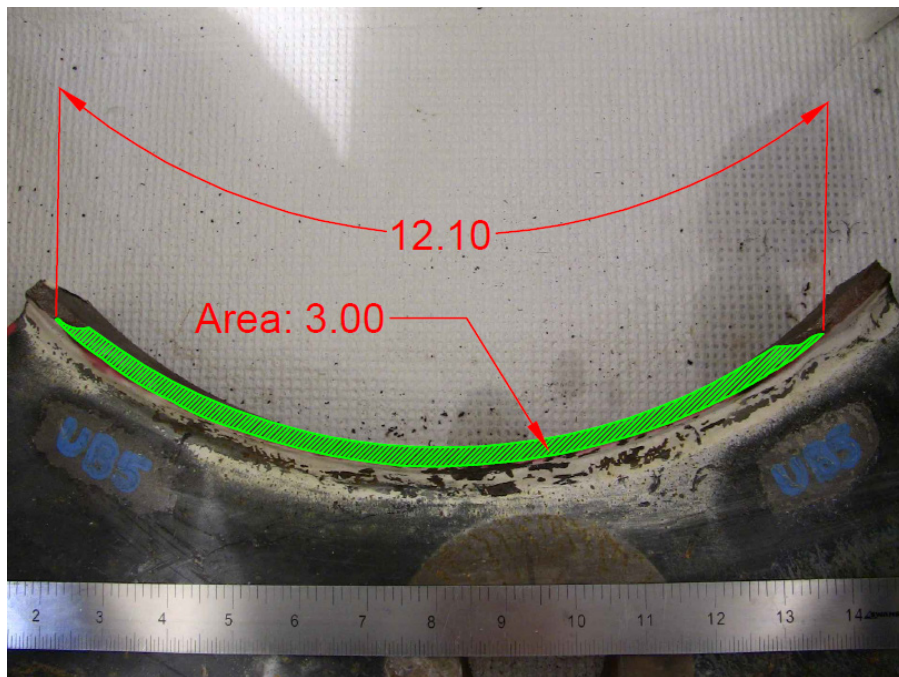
Photo. Specimen 1U3 fracture surface.
